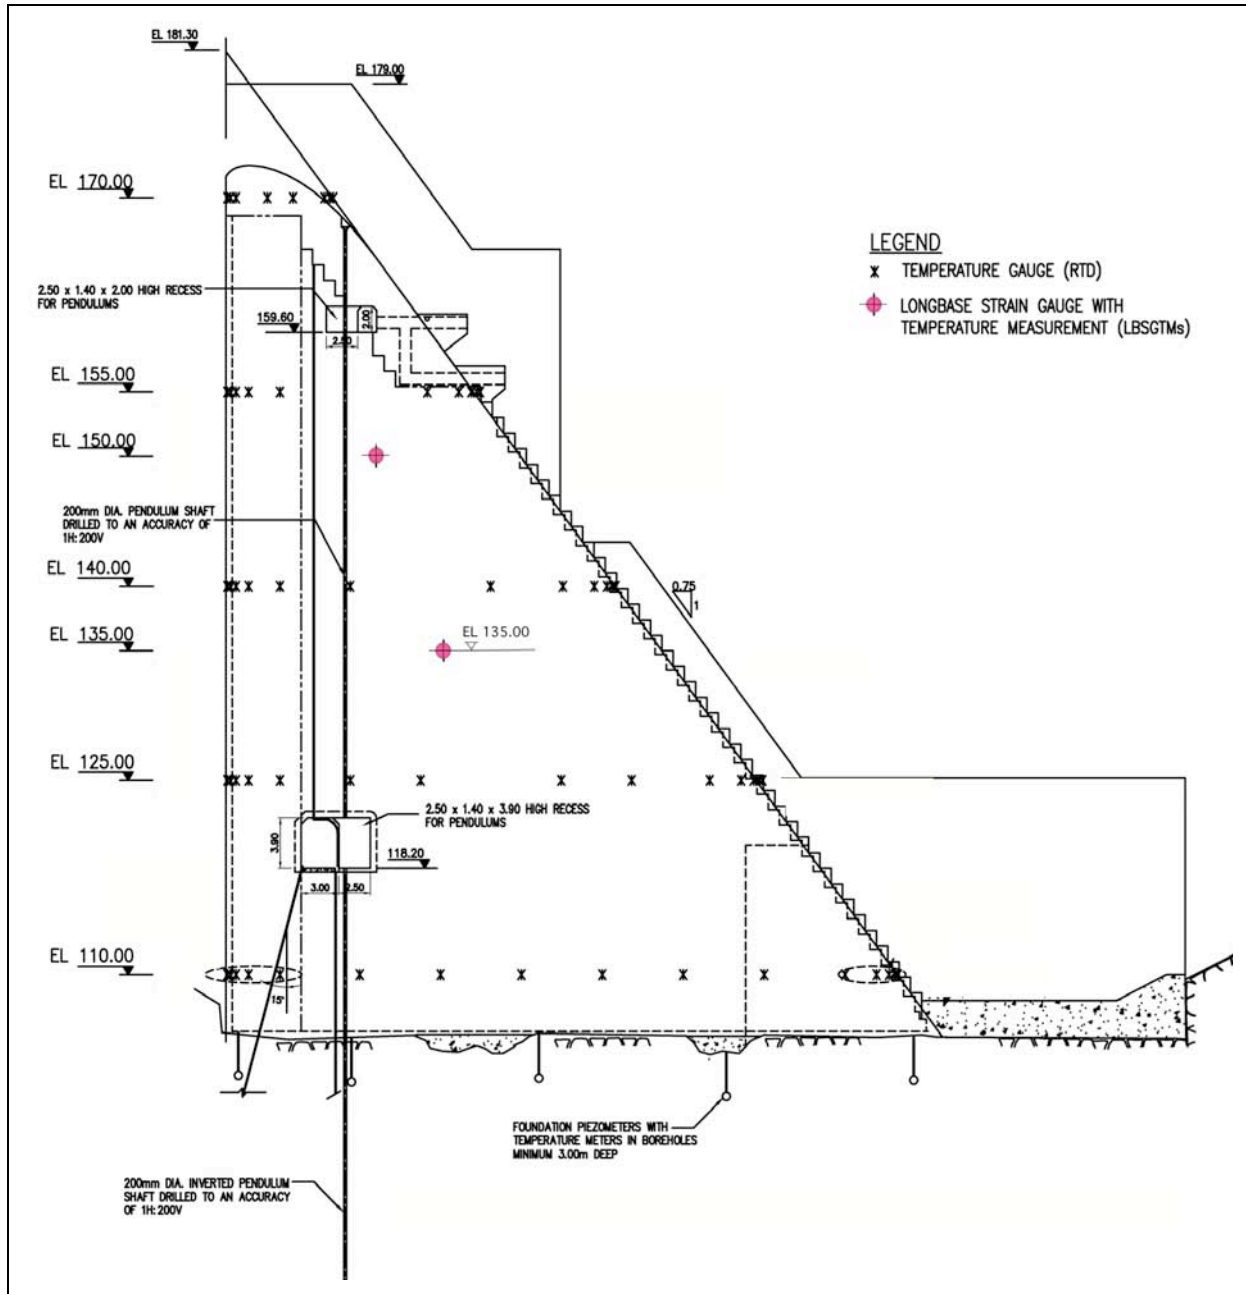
Typical Instrumentation - Spillway Section – Wadi Dayqah Dam⁽¹³⁾
